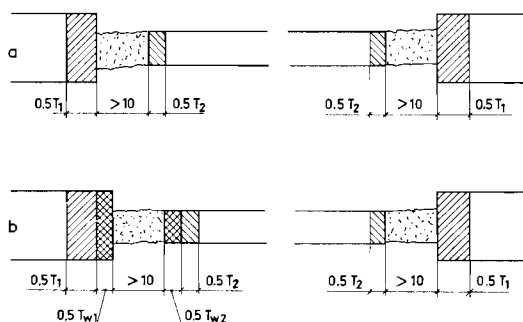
Very loose fit filled with plaster for two groups of components of dimensions with tolerances: (a) without and (b) with assembly tolerances.
